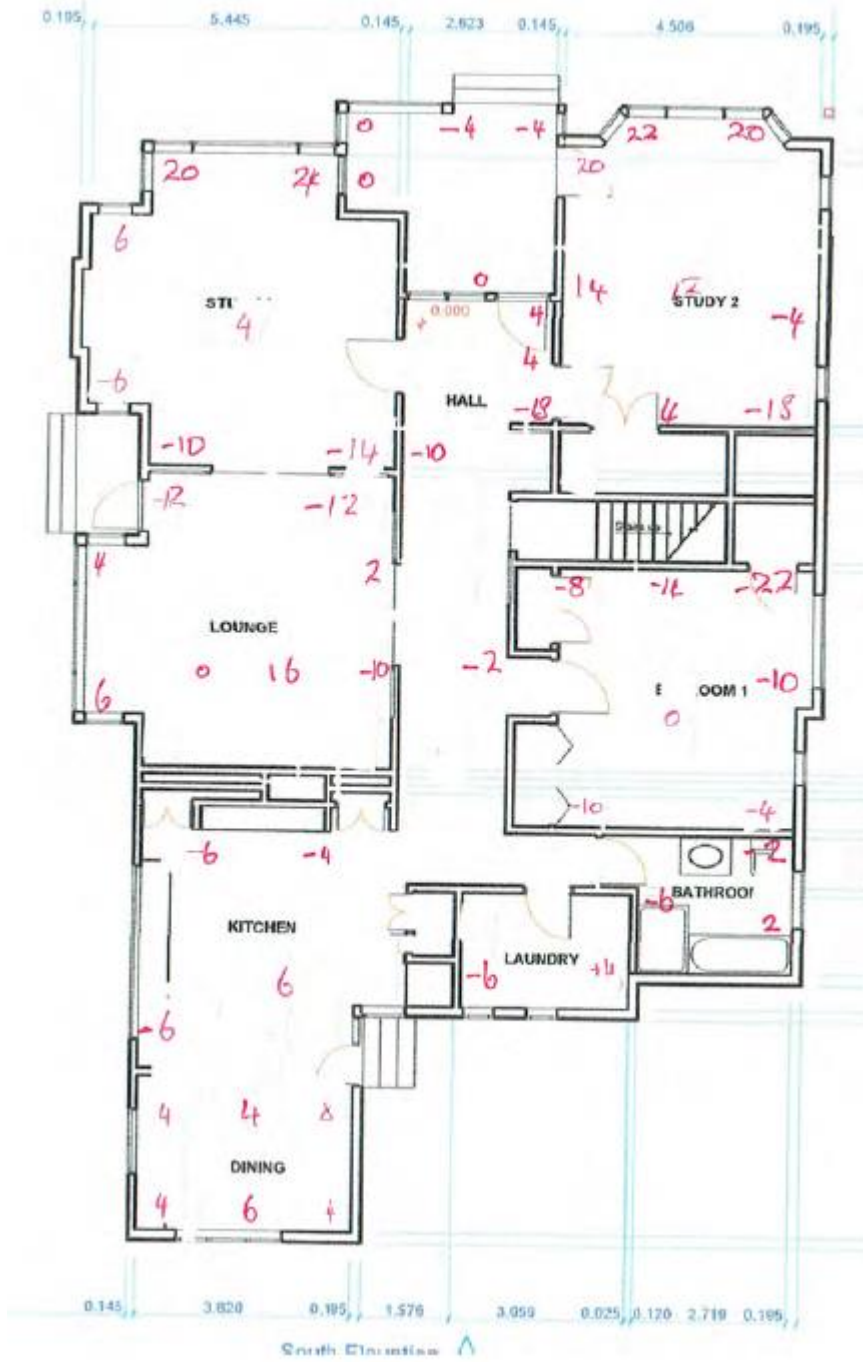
Terra Consultants ground floor post-repair floor level measurements
